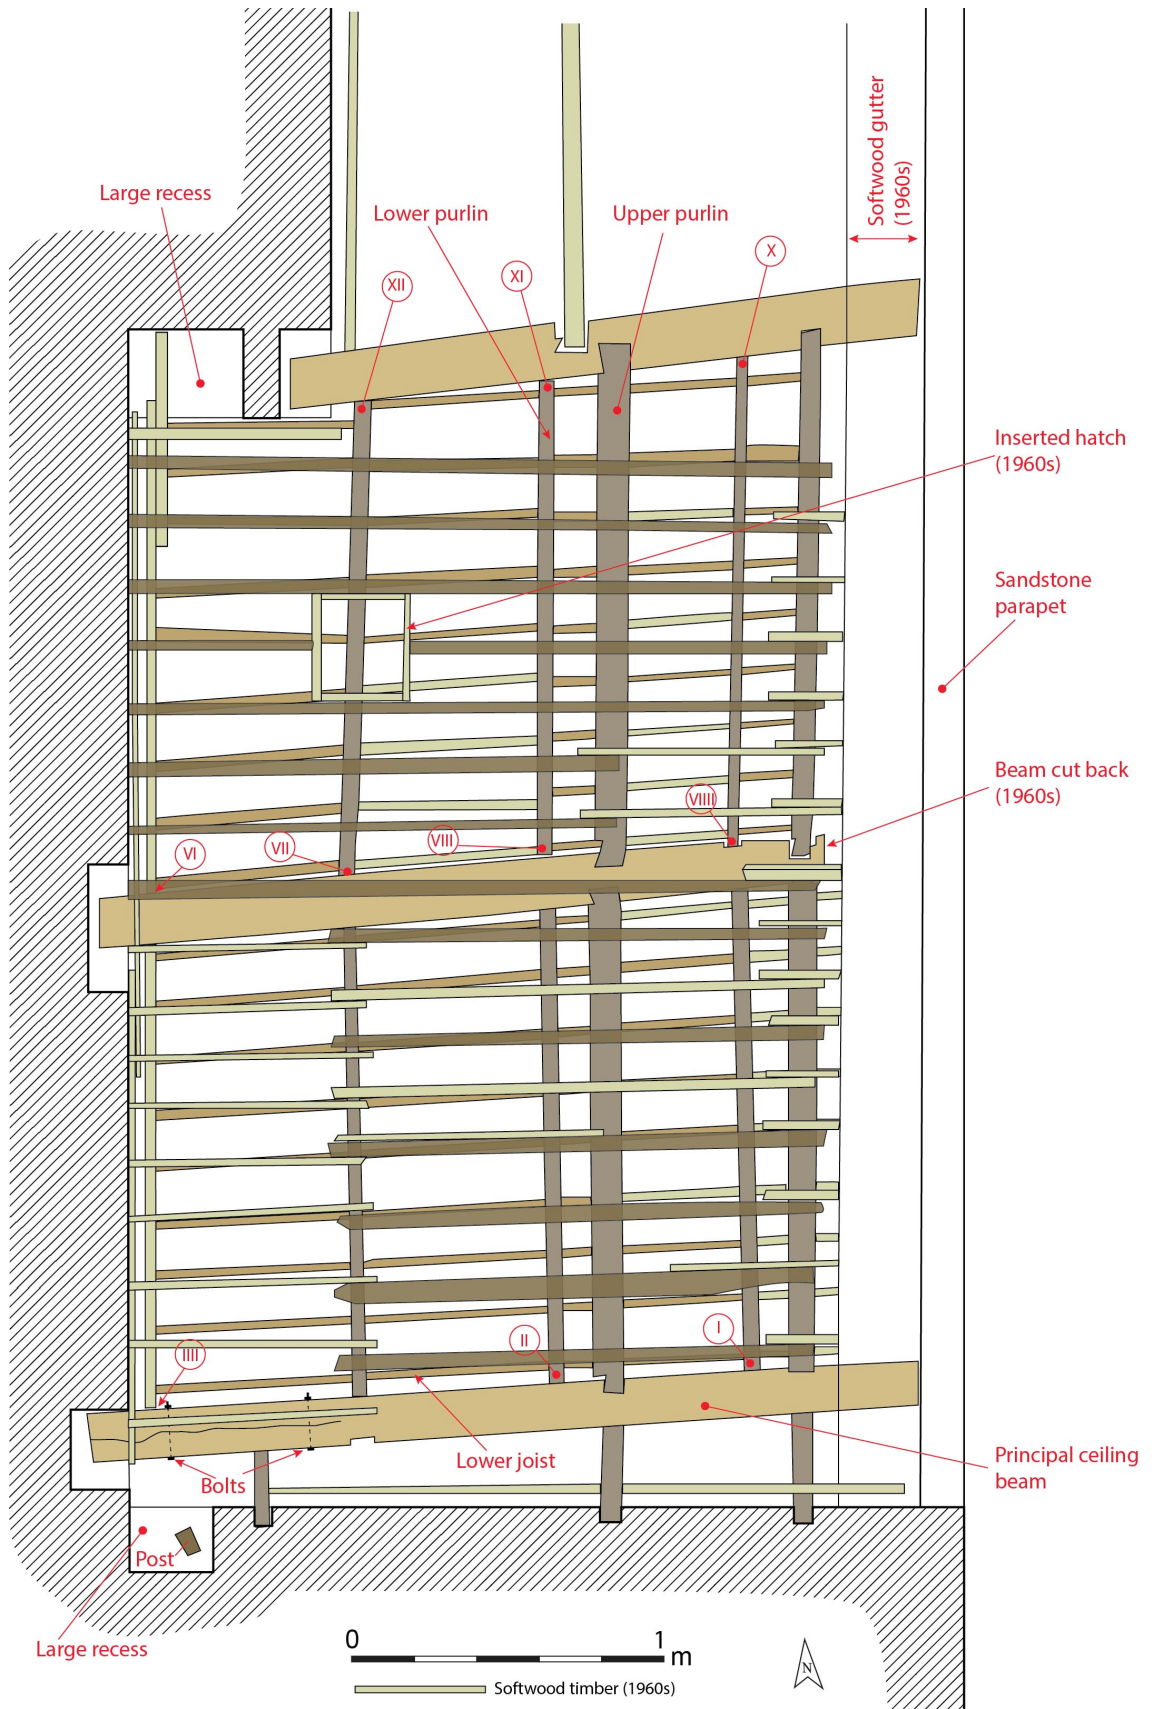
Plan of all timbers surveyed in Section E of the East Loggia roof
